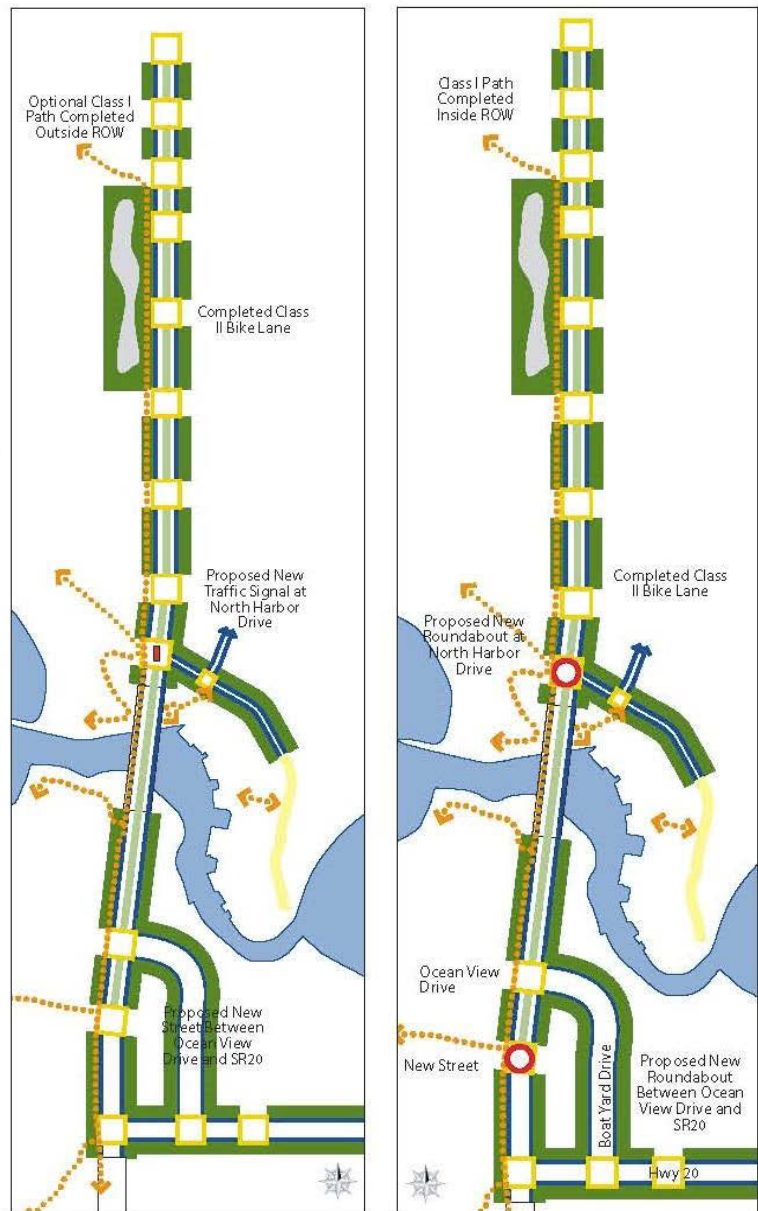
South Main Street “Baseline” Plan (left) with bike lanes and “Alternative” Plan (right) with Class I Trail and Roundabout (Source: South Main Street Access & Beautification Plan)
